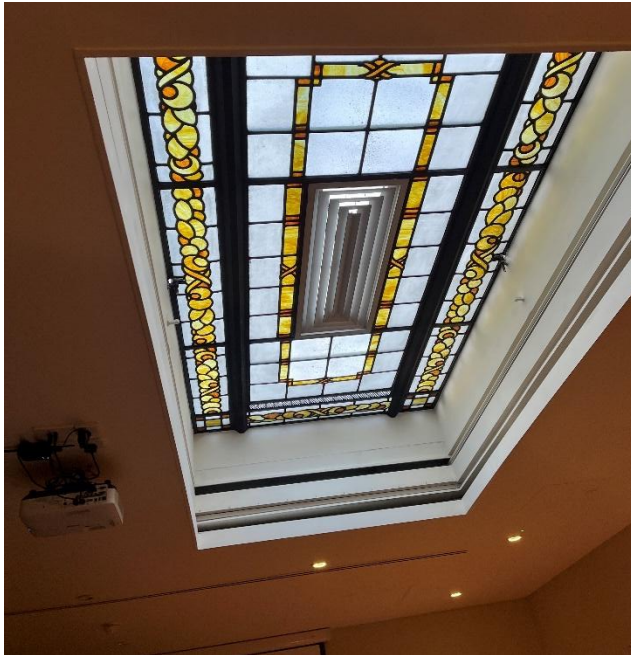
Open ventilation grille in centre of rooflight to learning space. Glazed lantern at roof level above rooflight.
